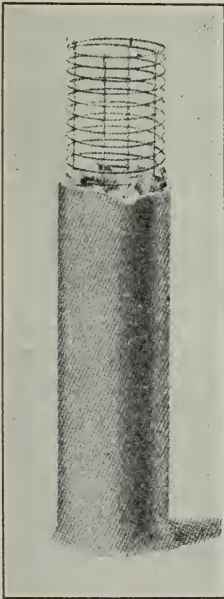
Column Reinforcement. Unit Concrete Steel Company, Chicago, Ill.
